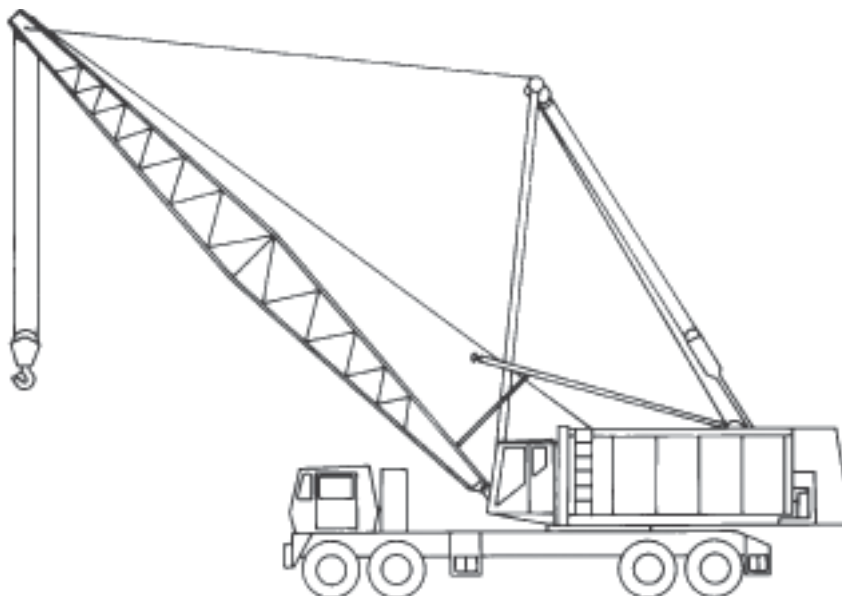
Wheel-mounted lattice boom with slewing upper structure
